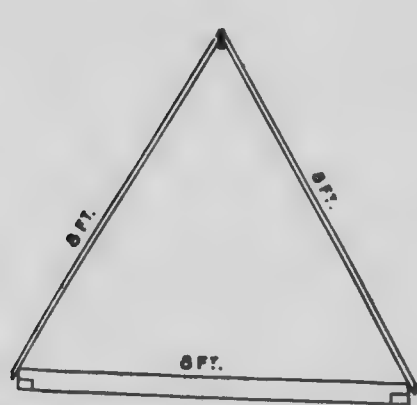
Fig. A.—Showing sills made of 4 x 4 inch scantling, and slope of roof. Two 4 x 4 inch scantlings 16 feet long, make the sills.
